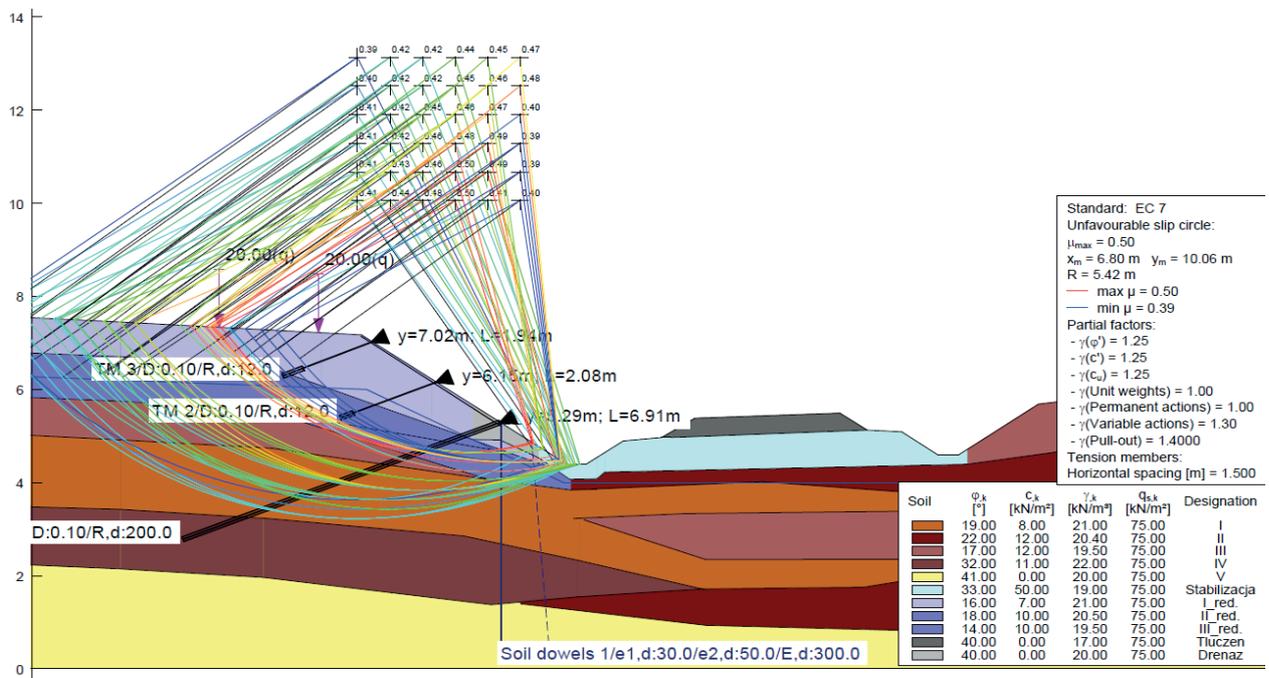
View of design cross-section with calculations for selected point 33+400 (Geotechnical project BAARS, 2020)
